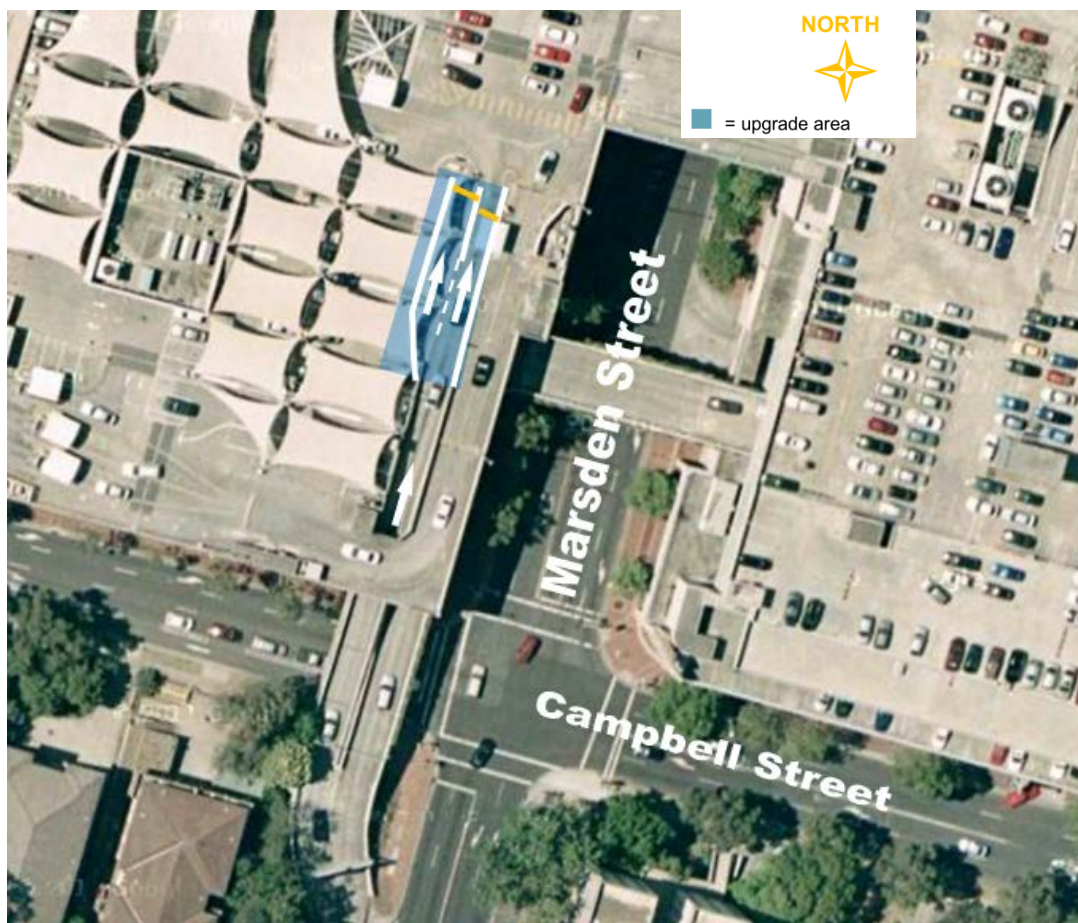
Proposed additional boom gate and lane on Marsden Street entry ramp
